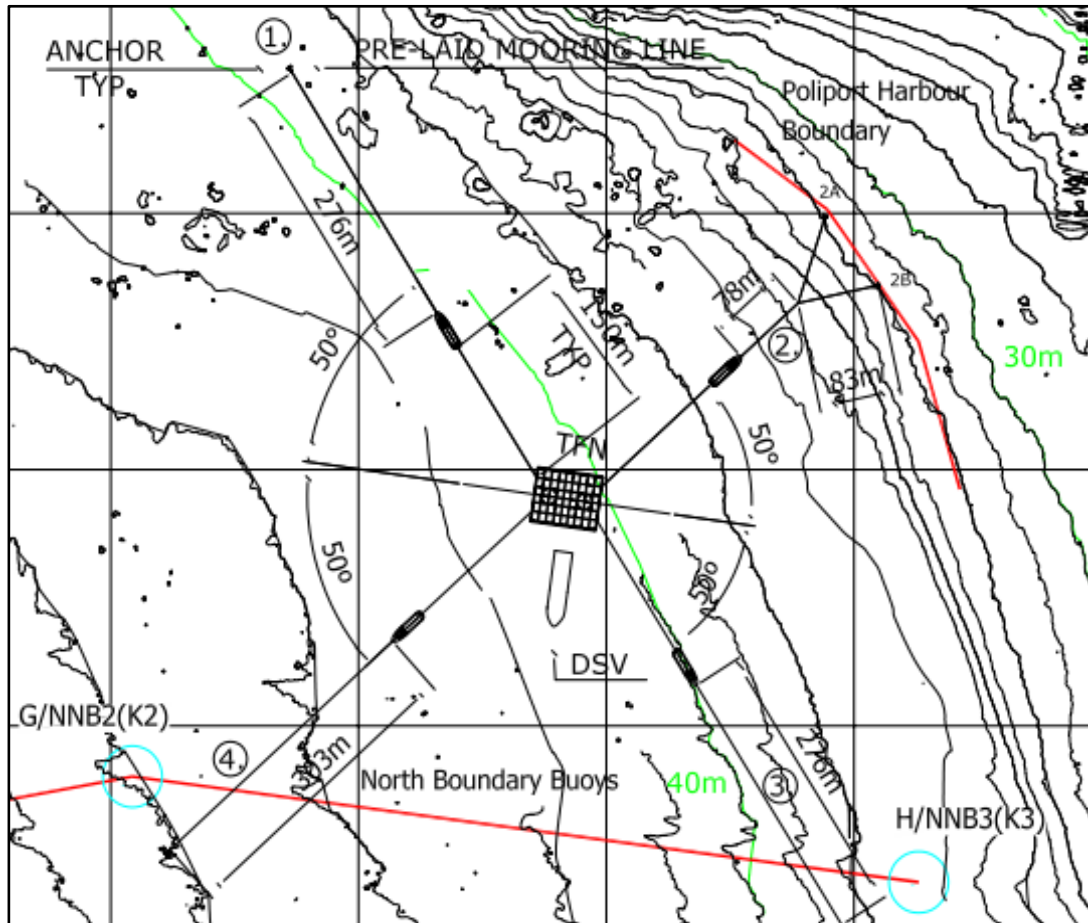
Mooring Lay out North TF. Courtesy of STFA Construction Co.
